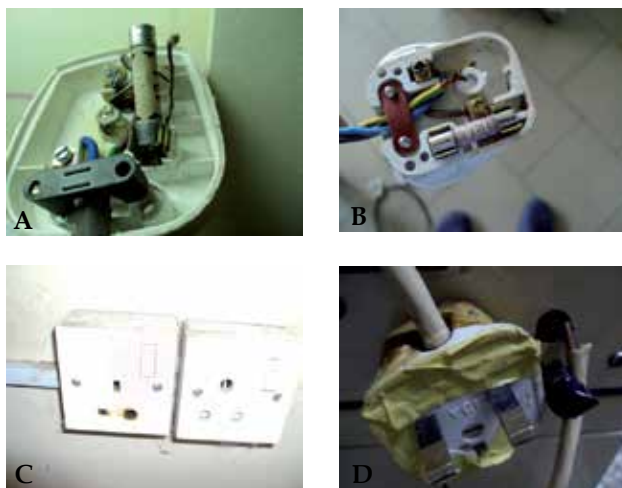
Unsafe socket and plug heads (A) plug head with hair wire instead of properly rated fuse (B,D) broken plug head with missing earth-pins (C) burnt socket
